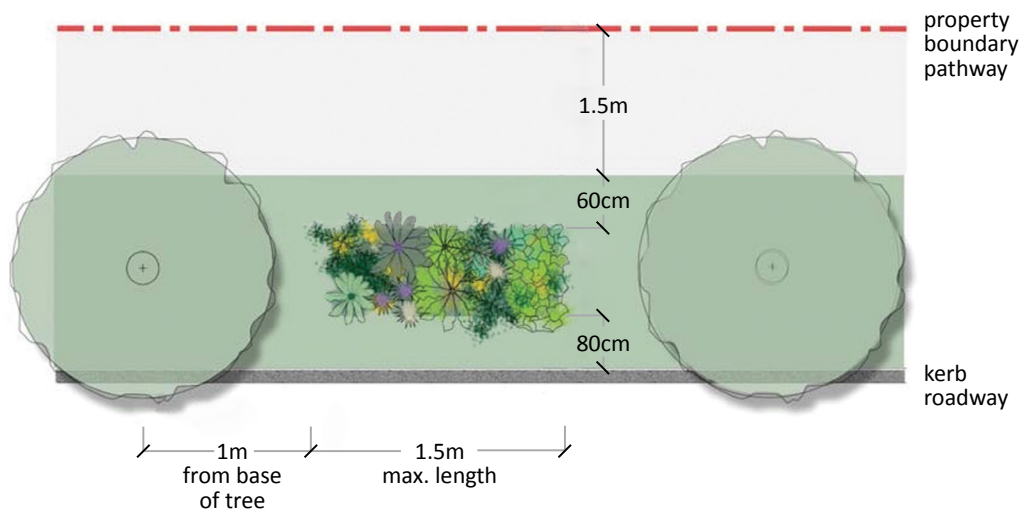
An 80cm access area must be maintained between the kerb and planter boxes. A 60cm access area must be maintained between raised beds and the footpath. A distance of 1m from the base of the tree must remain unplanted and free of planter boxes so as not to damage roots. Planter boxes must not exceed than 1.5m om length.
